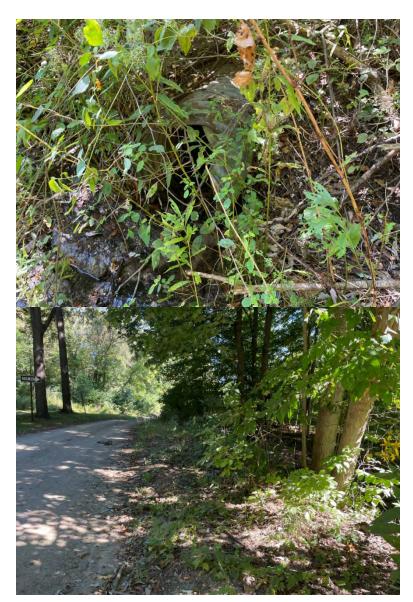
Fourth CMP outfall from River Front Drive into wetland on north side of road.
